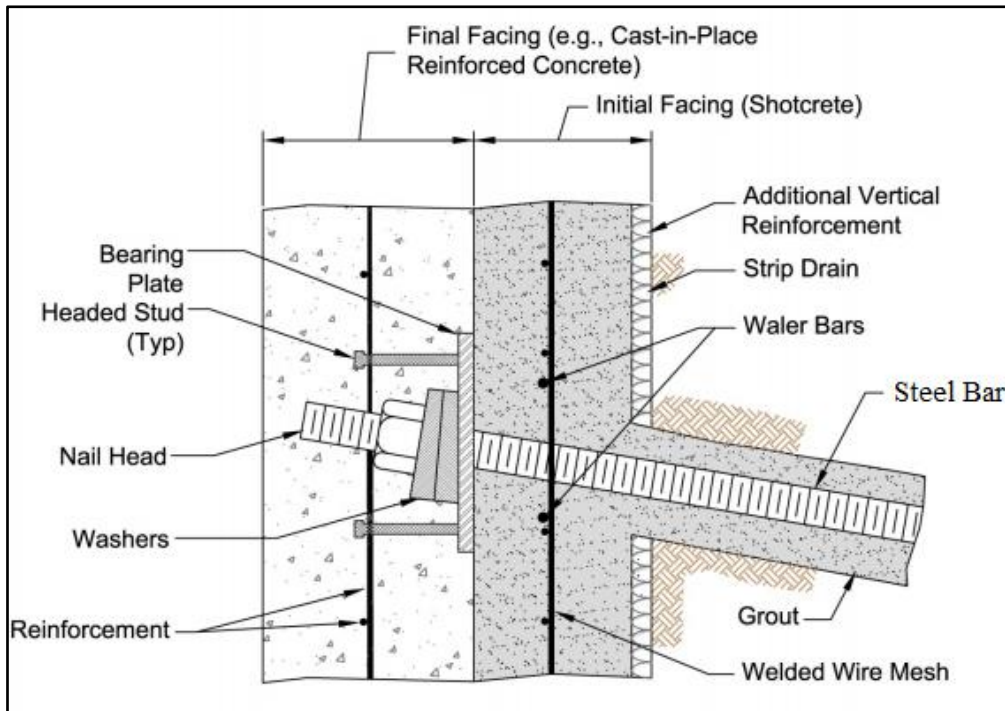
Typical Cross-Section of Soil Nail Wall (Lazarte, et al., 2015)
